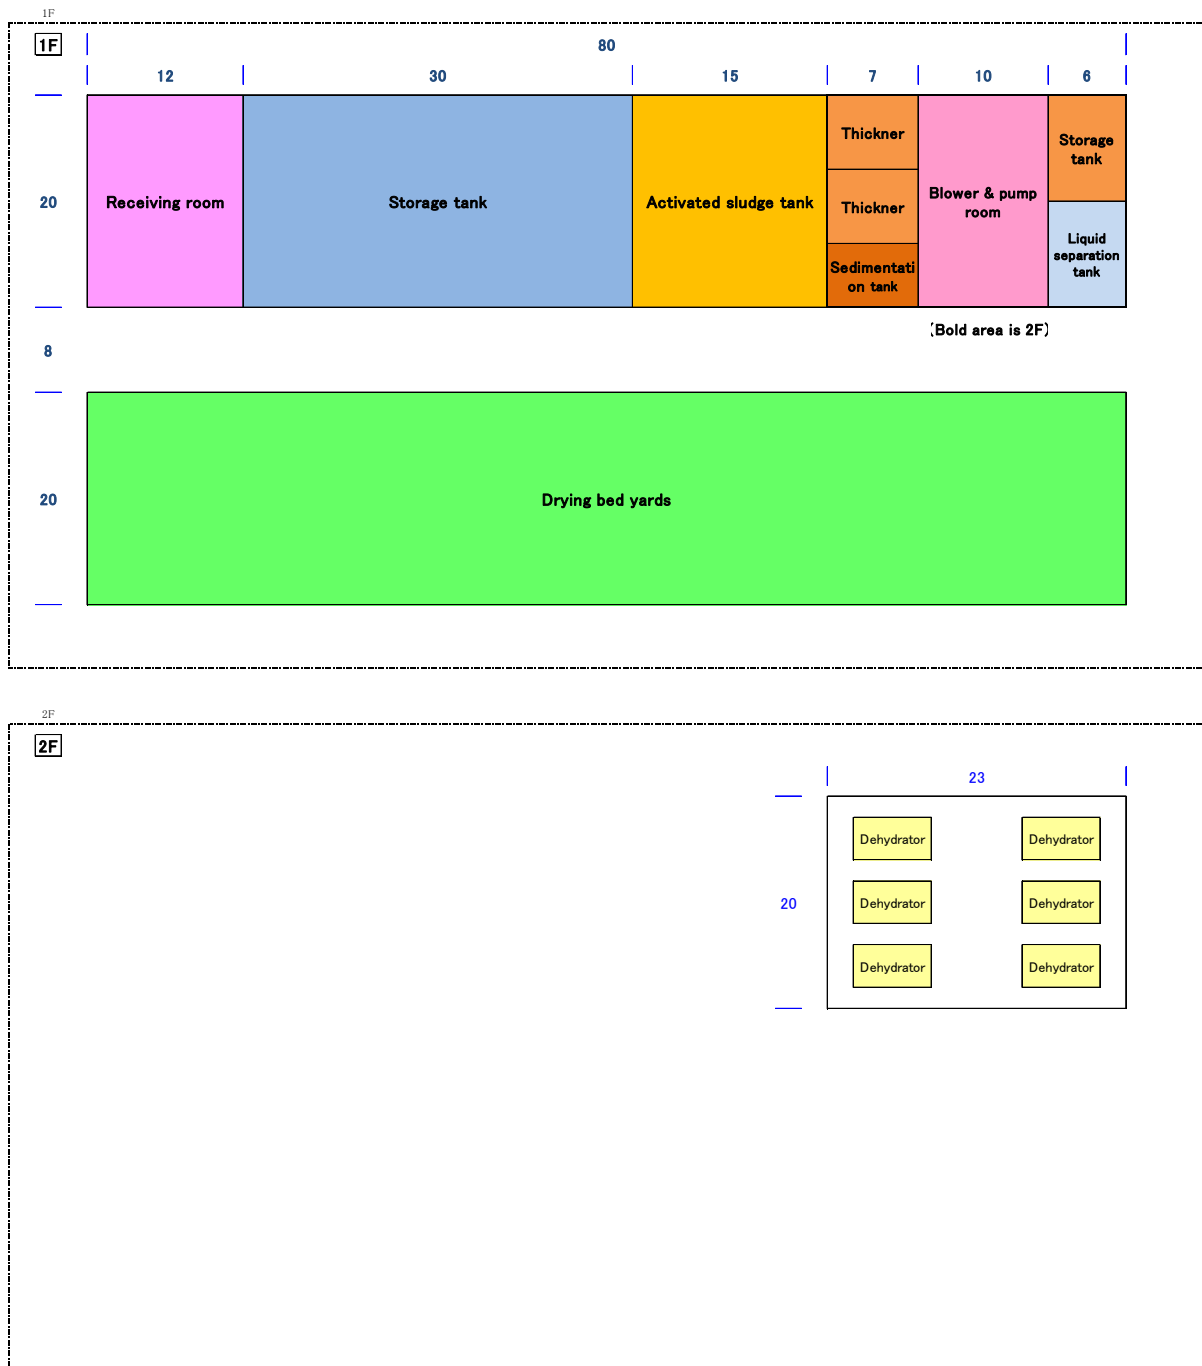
Proposed Layout Plan for New Sludge Treatment Plant
